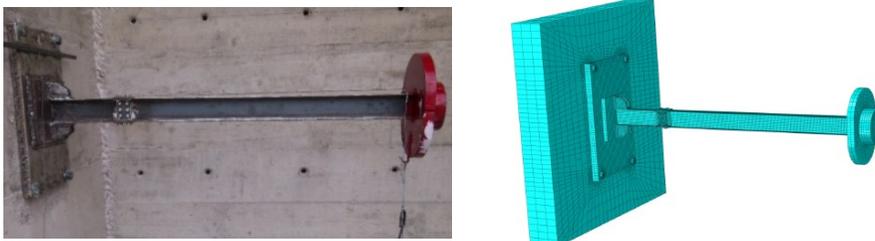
Experimental and numerical cantilever beam with bolted splice connection
